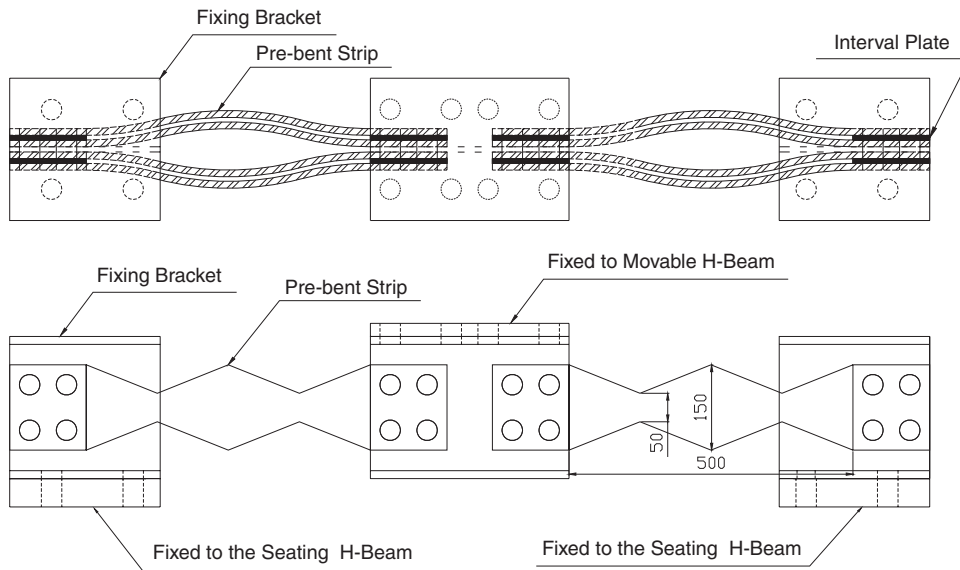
Details of the coupled pre-bent strip units tested in a symmetric layout (unit: mm).
